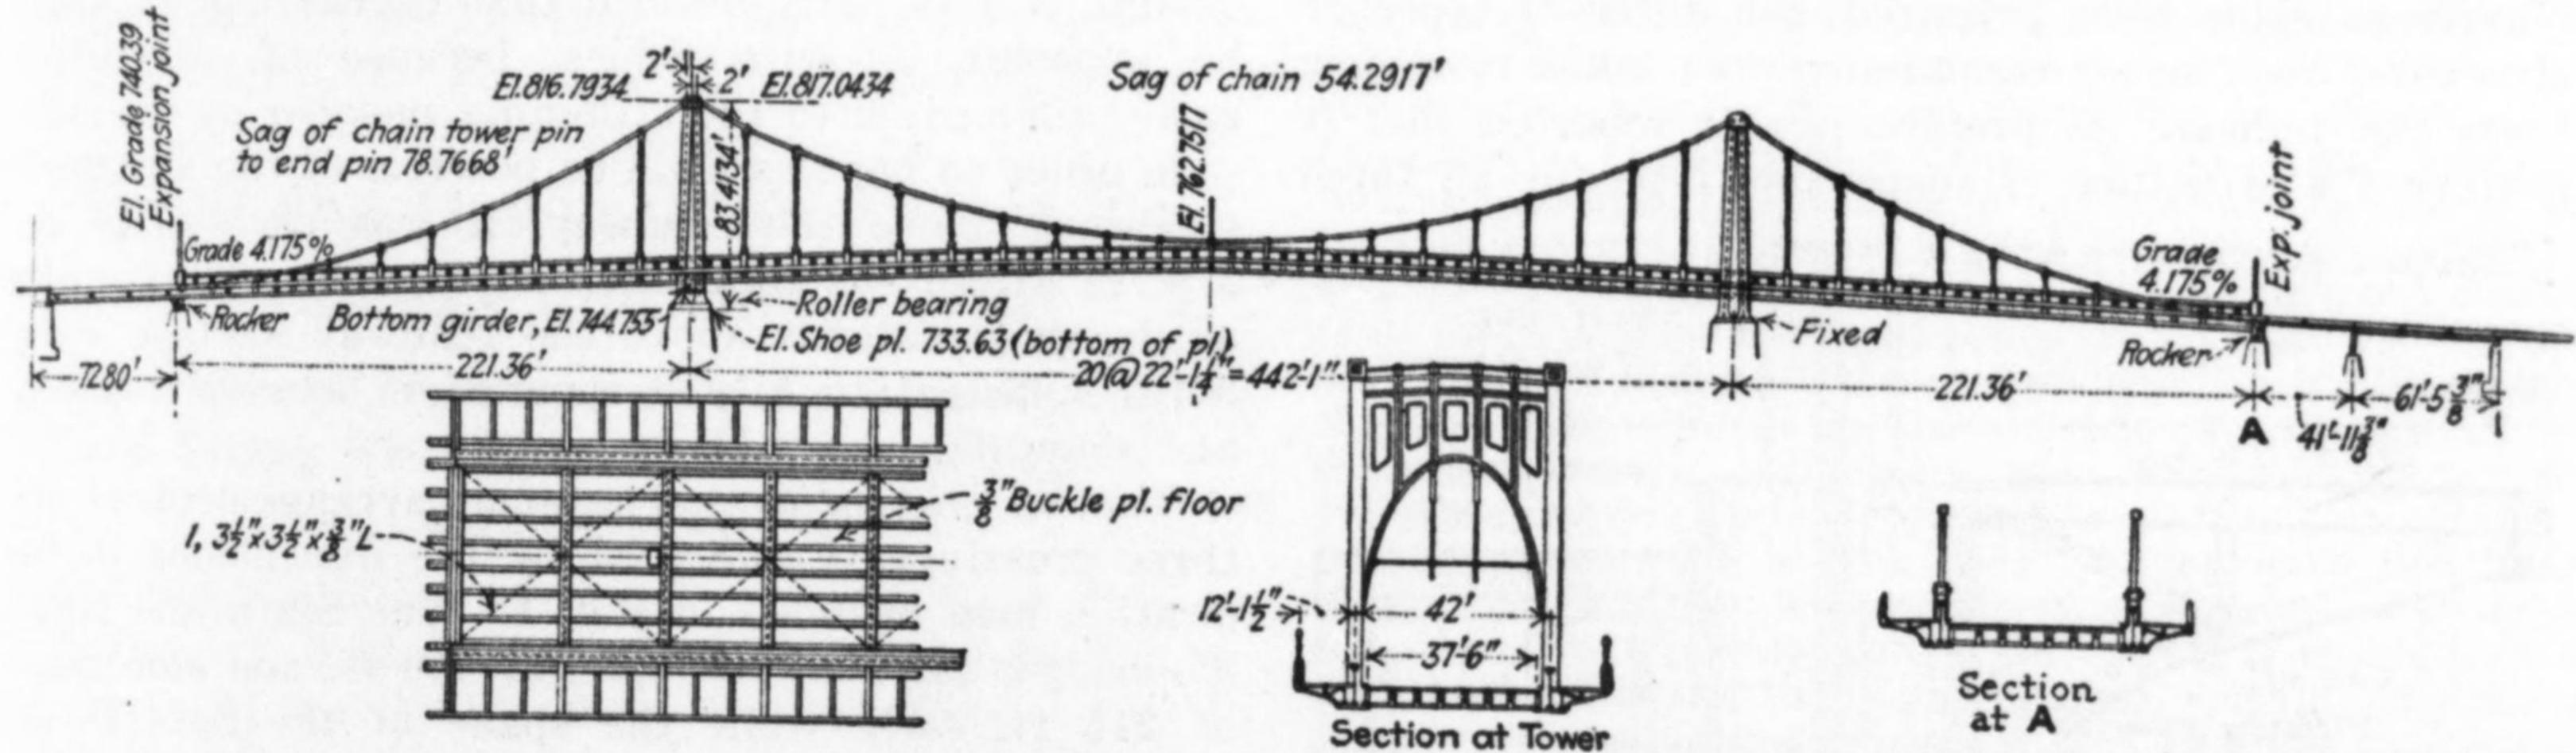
GENERAL CONSTRUCTION OF NEW BRIDGE OVER ALLEGHENY RIVER AT SEVENTH ST., PITTSBURGH The bridges at Sixth and Ninth Sts. will be of the same type and nearly of the same span length. The three bridges will be of identical appearance. The main cables are eyebar chains. The bridge is stiffened by heavy box-girder members at roadway level. These girders also act as struts
